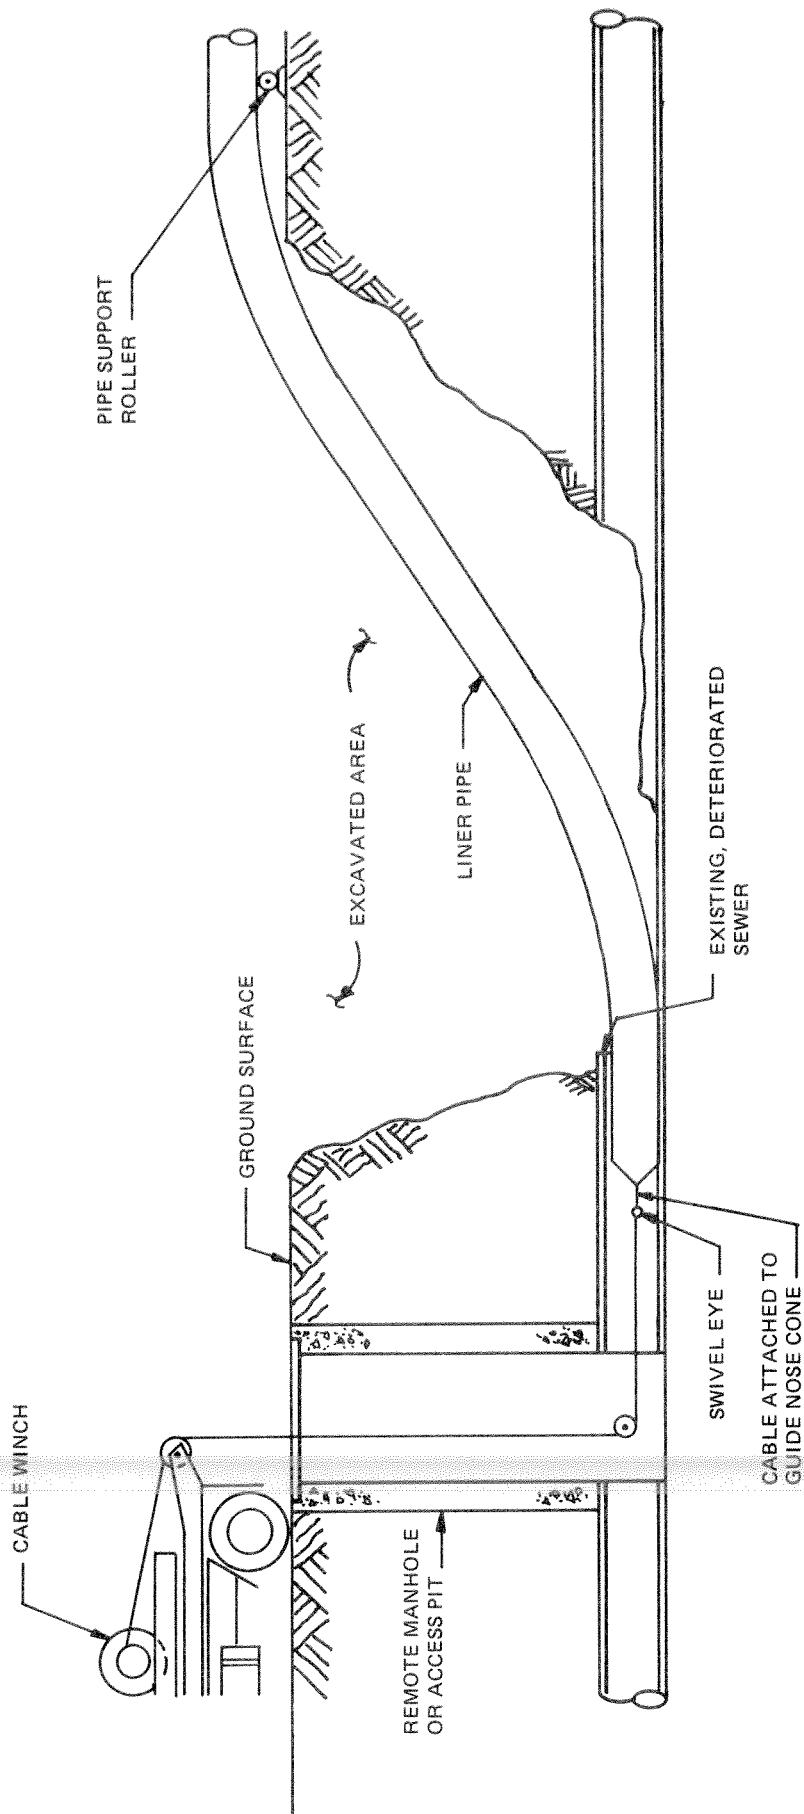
TYPICAL ARRANGEMENT FOR SLIPLINING
